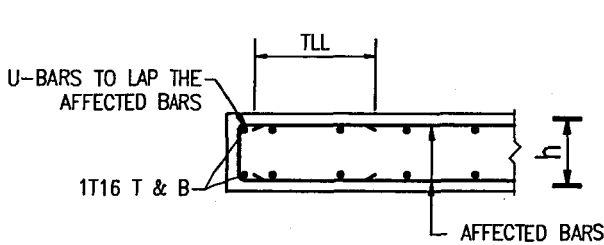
TYPICAL DETAIL OF TRIMMING BARS FOR WALL OPENING
